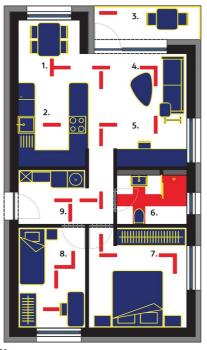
Floor plan of an apartment for blind and partially sighted (Živa Valjavec, Delfina Rustemi, Lana Bavcon, Ana Marinko, Pia Mišič, Korina Kuzmic (2023). Floor plan [Computer sketch]).
